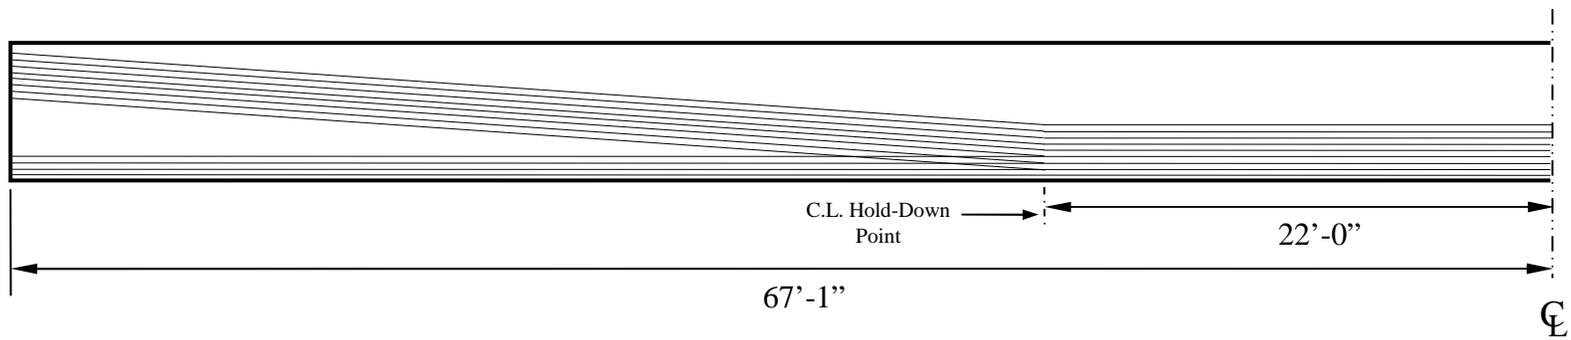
Profile and Hold-Down of Draped Strands for BT-72 Girder
